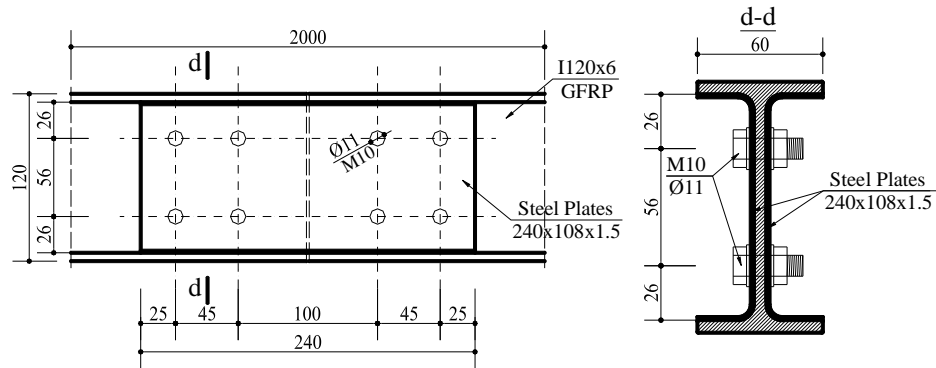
Specimens geometry for S3 series (dimensions in mm).
